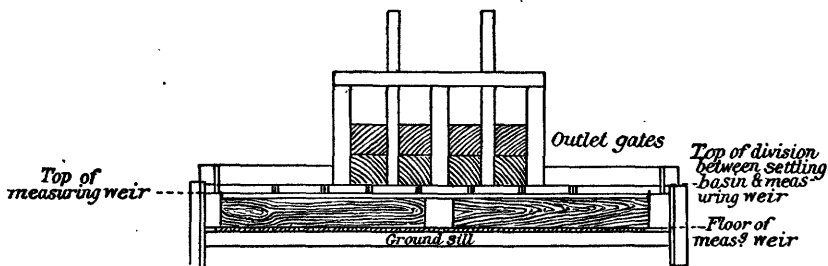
End elevation of measuring weir on Gage canal, showing end elevation of outlet gates beyond.
